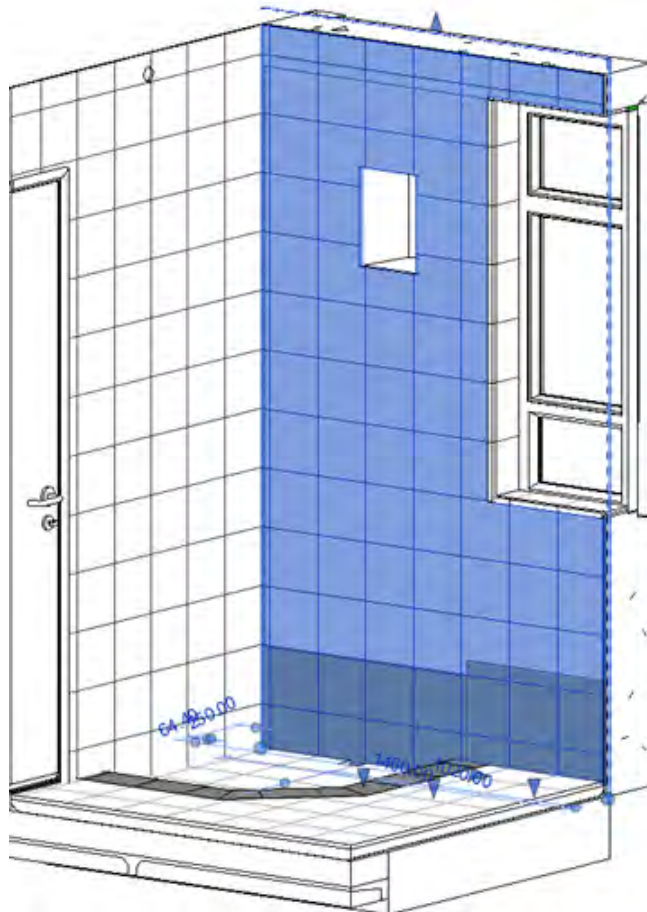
3D View of Bathroom modelled with Wall Finishes
